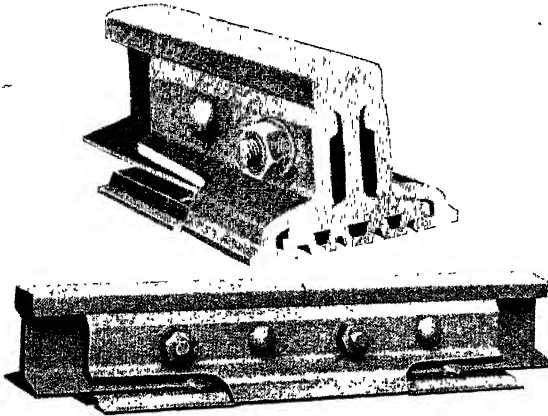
Wolhaupter Rail Joint and Section Through Center.
